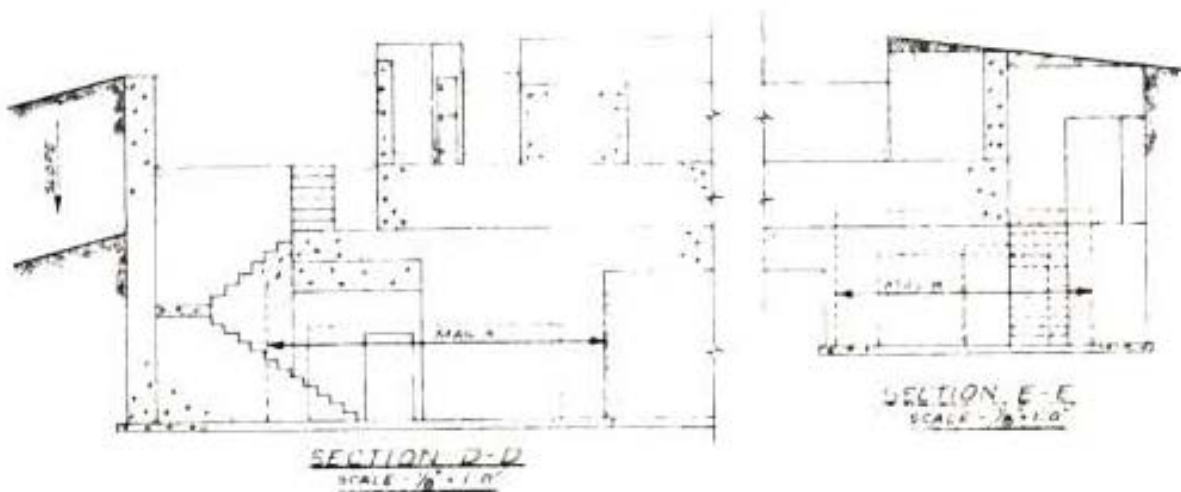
Cross section of WP1329, gun battery #2, Corps of Royal Engineers, constructed 1895, modified 1923/24 and 1938 (DND, 1964).
